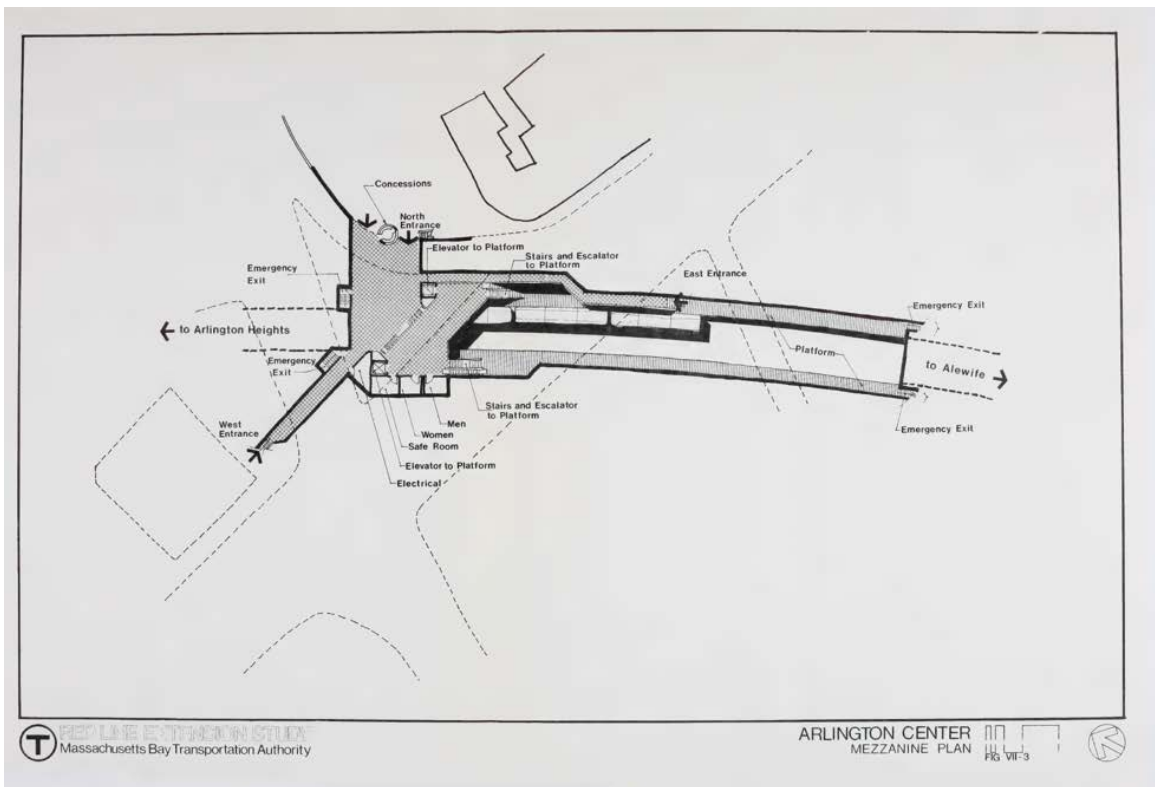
Arlington Center station mezzanine plan. Source: EIS VII
